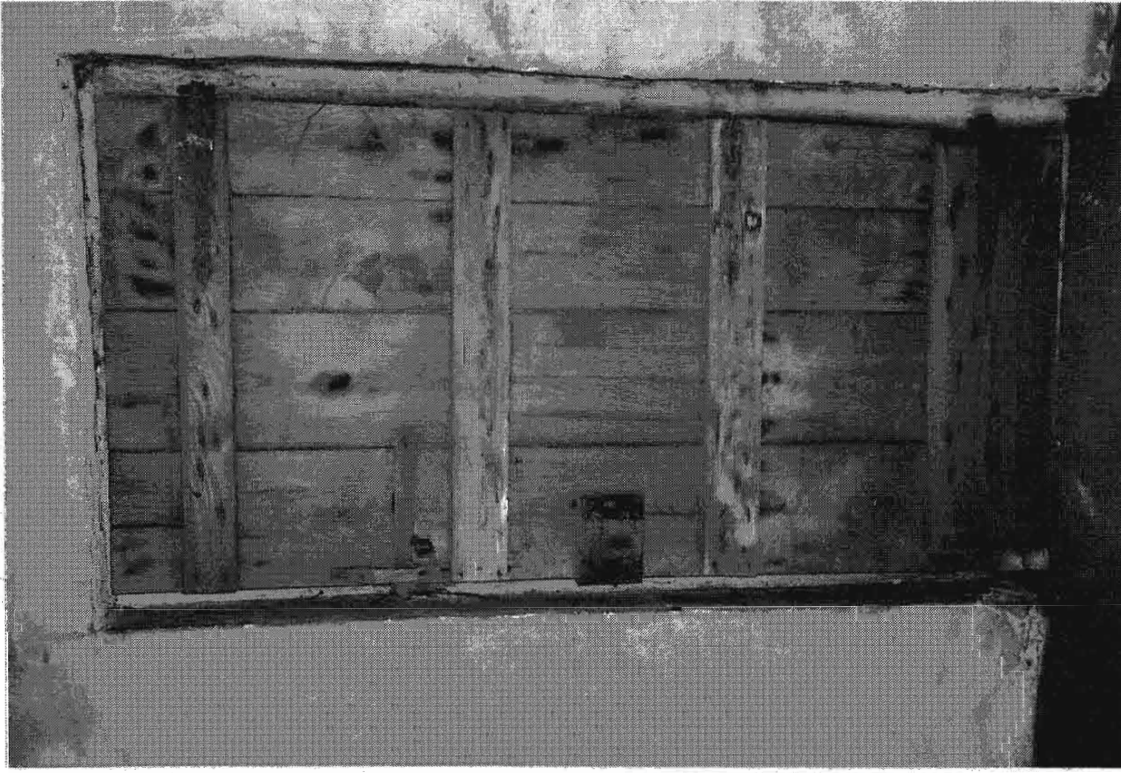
Rear of door at S3 showing the ledges, wooden latch, later 19th century lock, plain form of the rear of the moulded planks, sirap hinges and evidence of re-hanging of door in the key-holes by the hinge edge.
